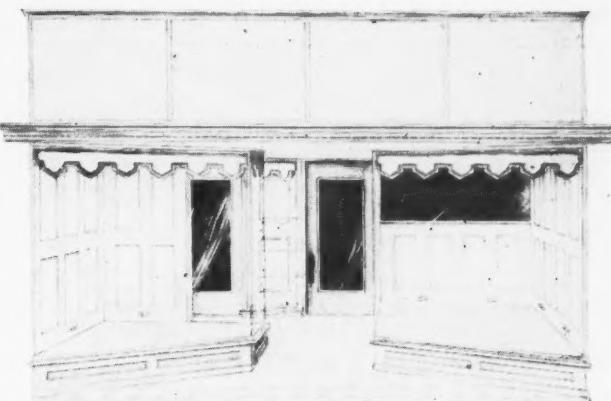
This store provides entrance to upper floors without losing maximum width of windows
